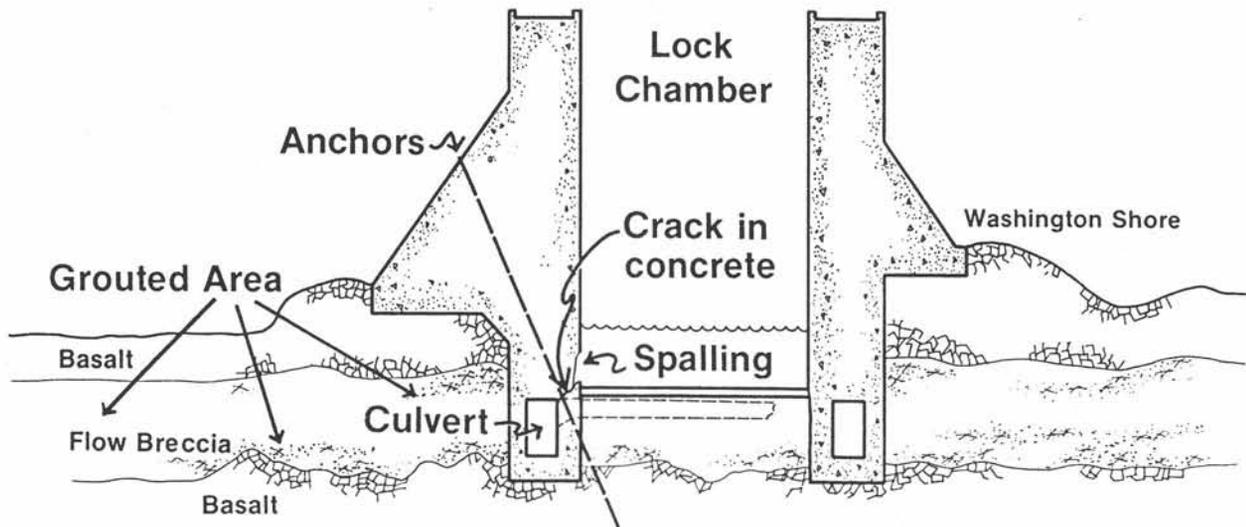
Typical section of lock repair required at John Day Dam showing locations of tendon anchors.
